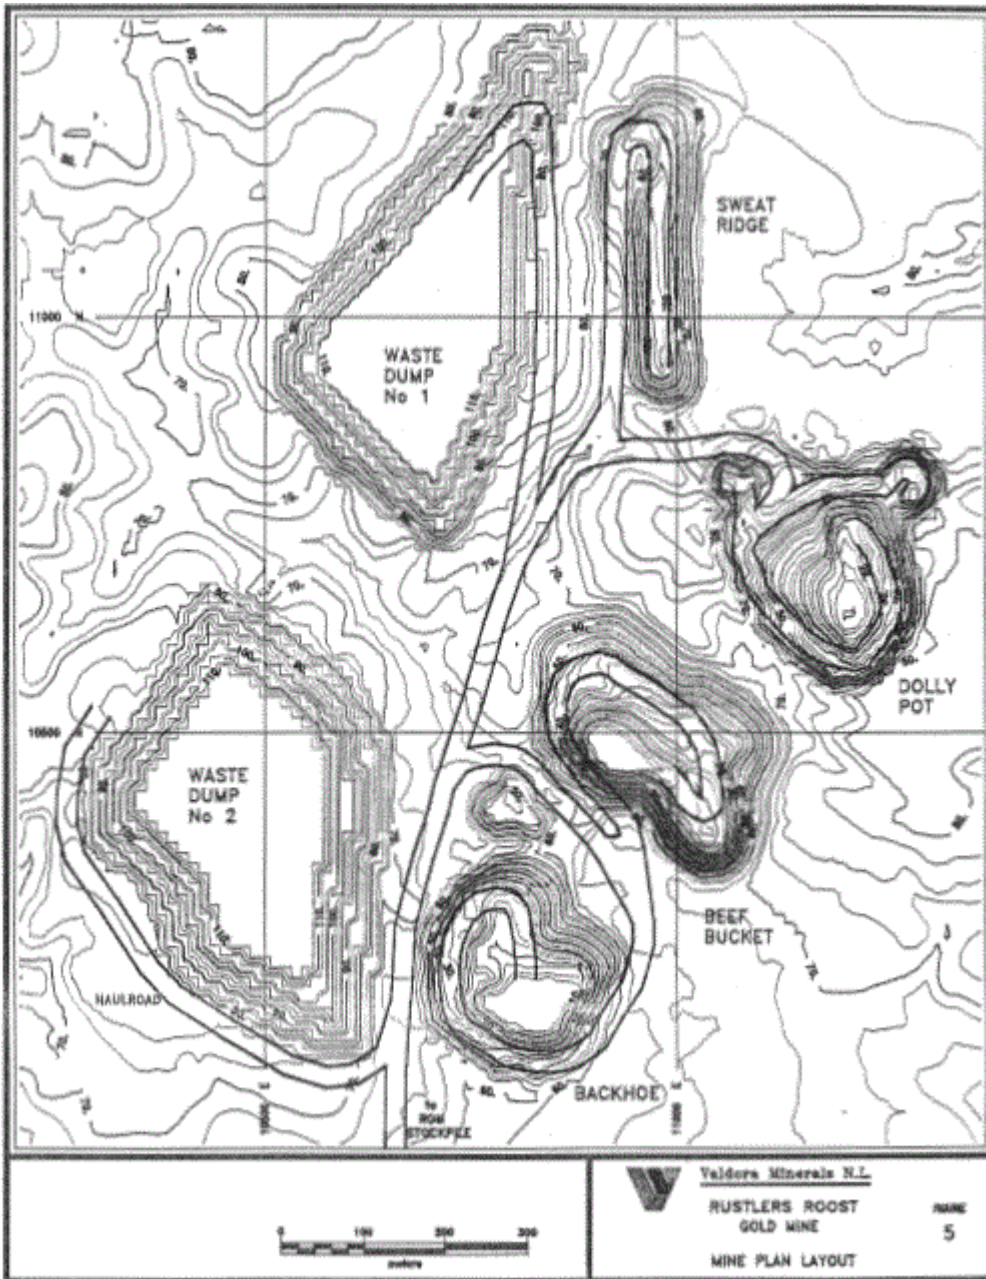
Mine plan layout depicting location of each pit, Backhoe, Sweat Ridge, Beef Bucket and Dolly Pot (Valdora 1994)
